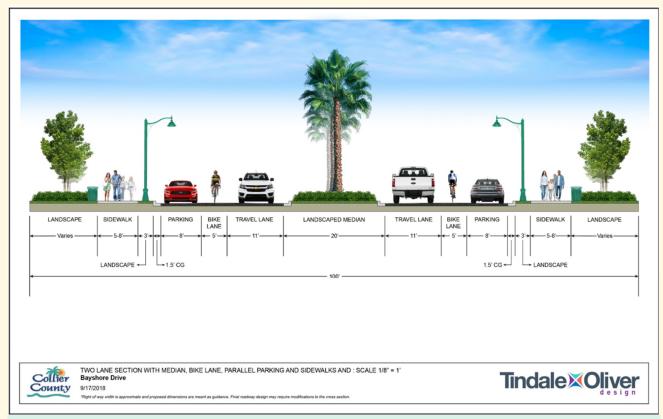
Potential Cross Section for Bayshore Dr
